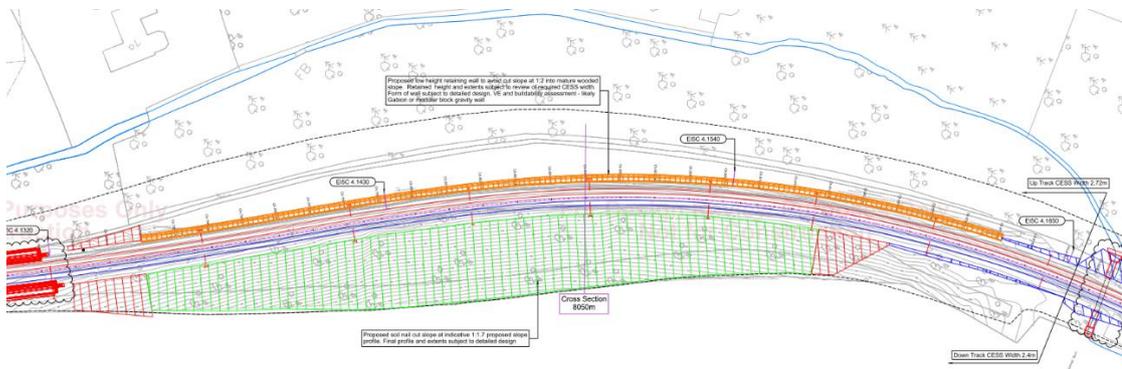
Proposed Earthworks Plan at Chainage 8050m
